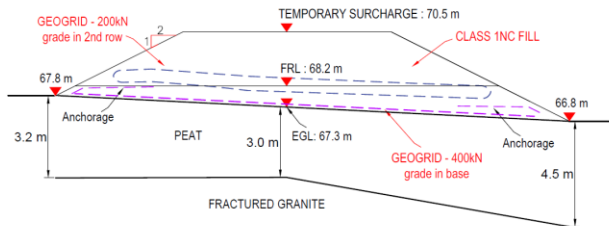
Embankment cross section at IC1, showing levels and geosynthetic reinforcement
